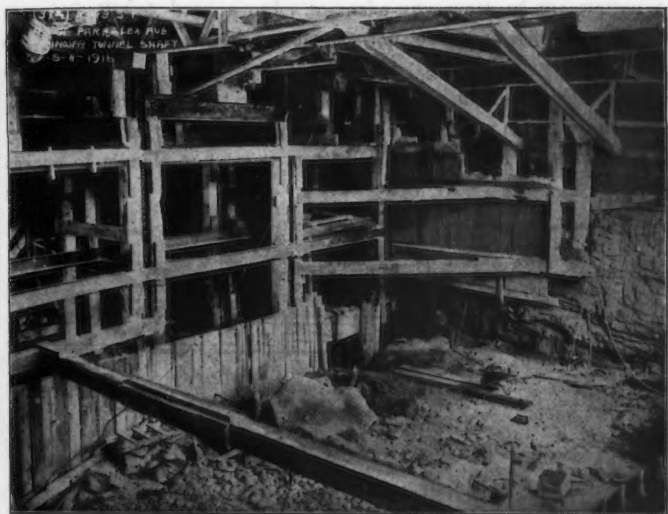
EXCAVATION FOR SOUTH SIDE OF ELEVATOR SHAFT COMPLETED TO GRADE OF ENGINE-ROOM FLOOR.
